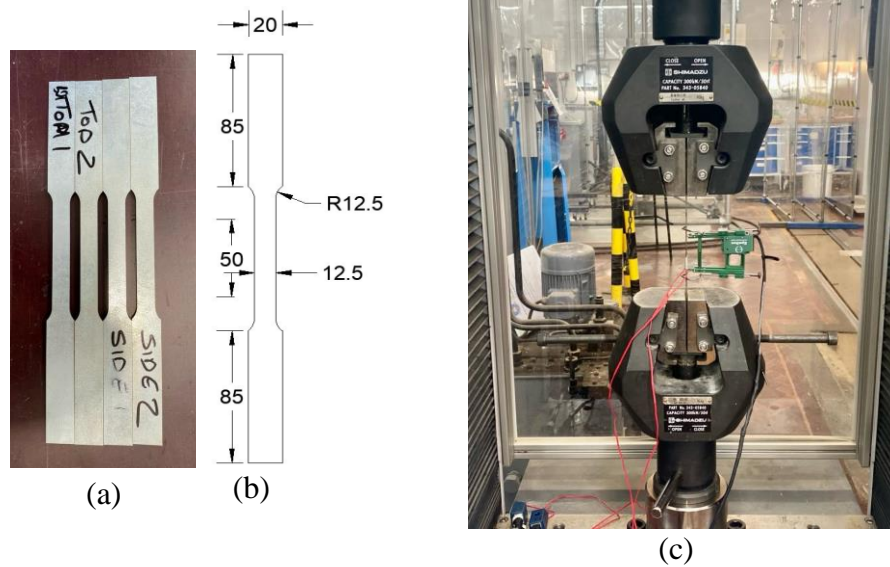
(a) Tensile CFS coupons, (a) dimensions of coupon (in mm) and (c) test set-up
